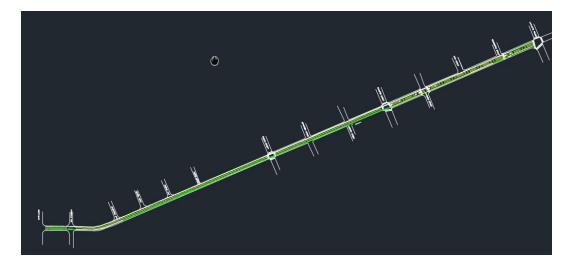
Plan view of Final Design for Benton Street on AutoCAD
